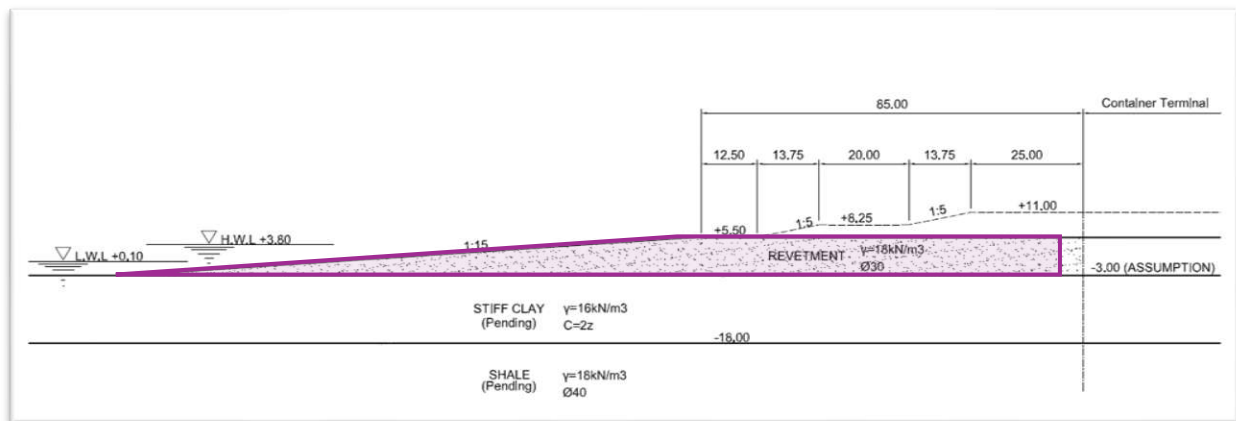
TYPICAL REVETMENT CROSS SECTION
